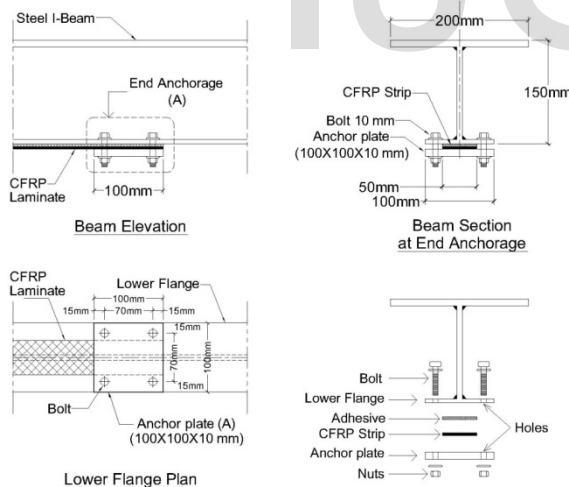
Configuration of anchorage system type (A) – Beam STA
